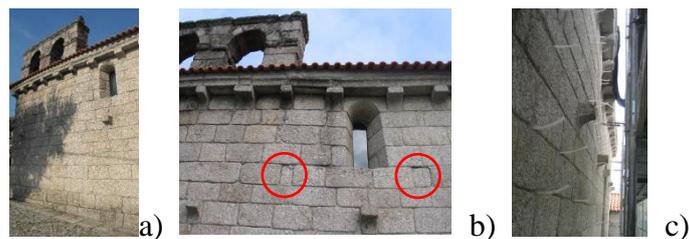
View of the Gondar church wall that exhibited out-of-plane deformations (a), view of two two-leaf stone connectors (b), injection of consolidation grouts (c).
